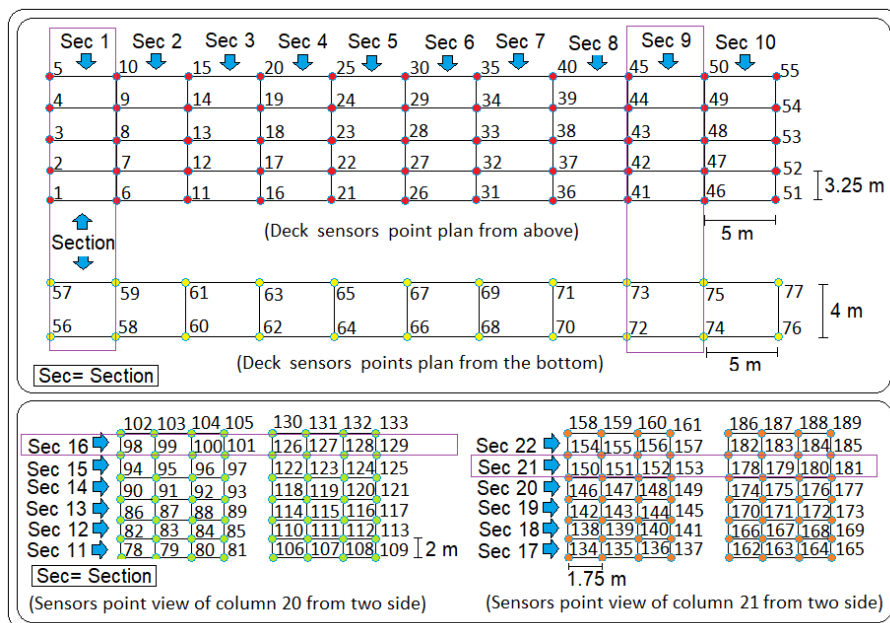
Sensor point numbering and division in each section of a span of the Arosa bridge
